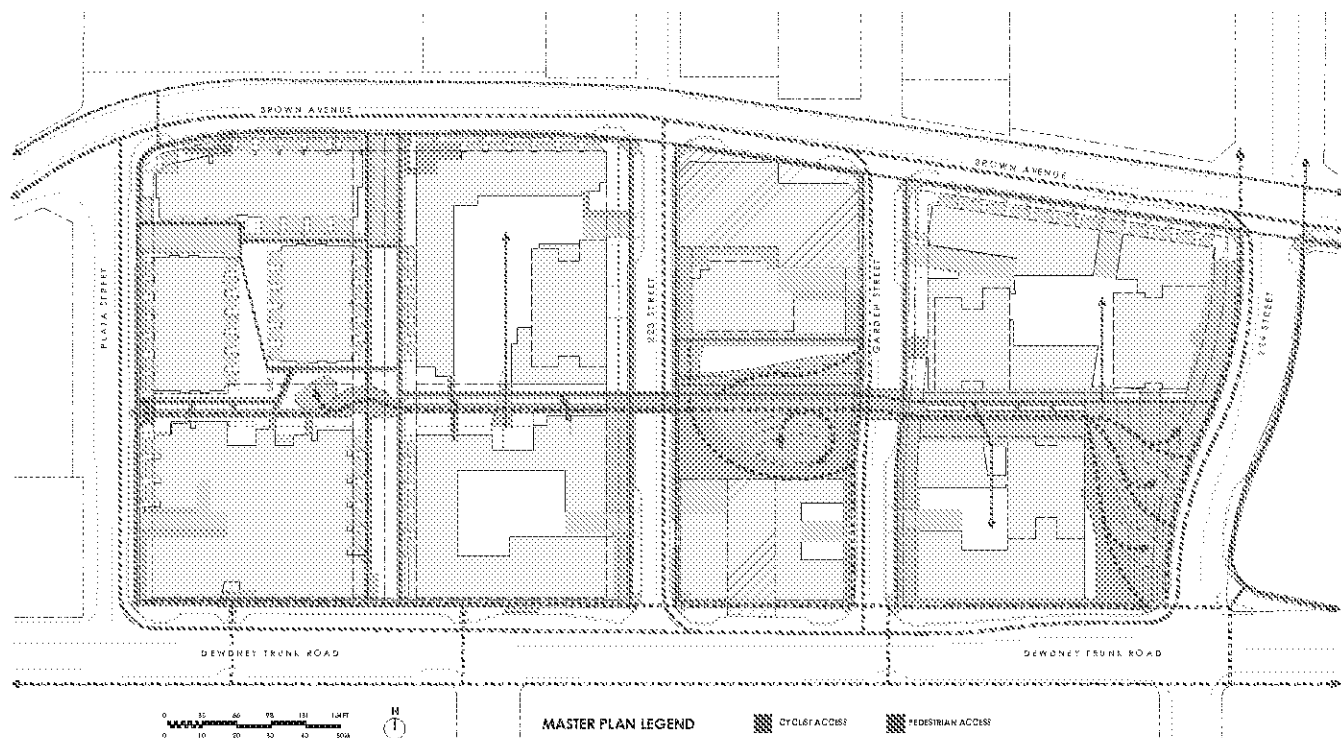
Cycling and Pedestrian Access Plan. Pedestrian walkways of all sizes should seek to create a visual hierarchy through the paving materials & patterns (Building footprints and features shown may vary).
